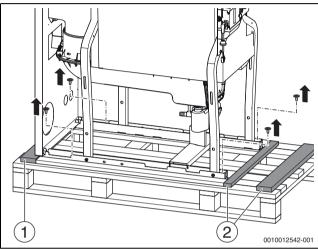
Detaching the boiler from the pallet (example for illustration purposes)
